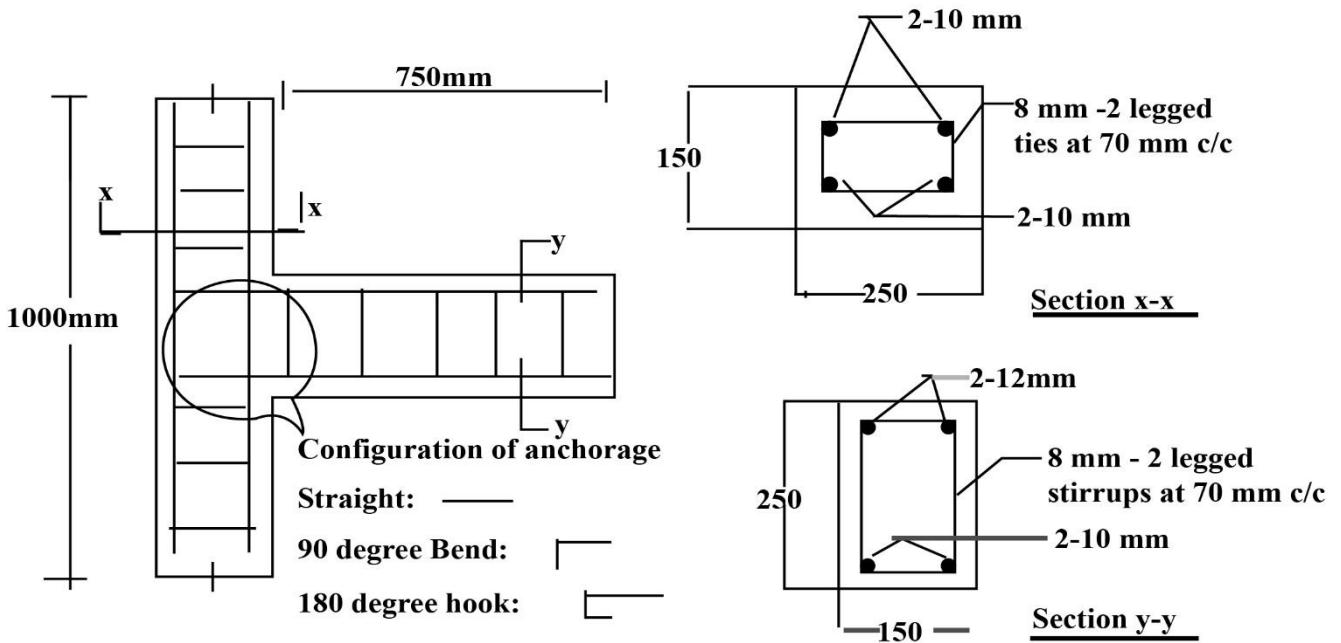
(a) Typical Reinforcement details of conventional specimens (group-A)
